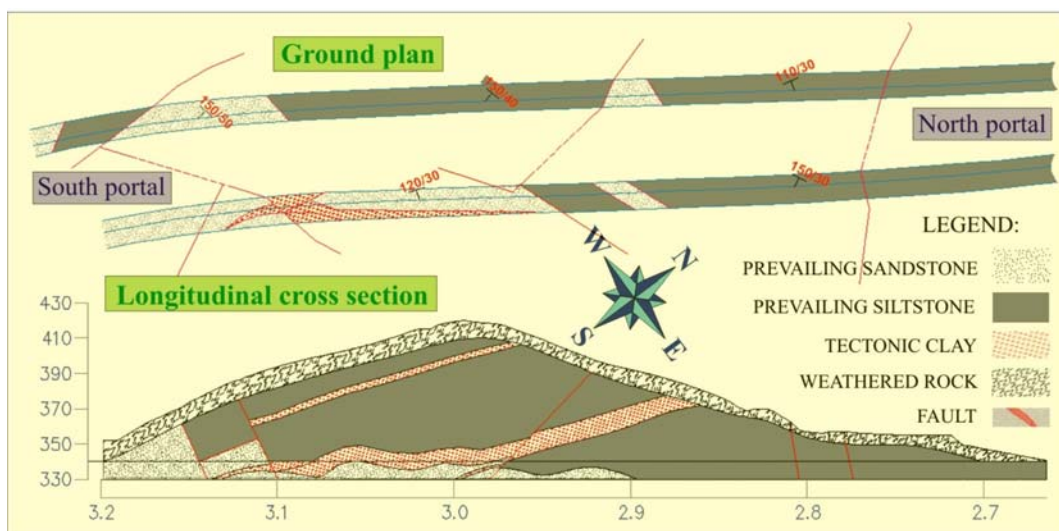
Geological ground plan and longitudinal section of the Golovec tunnel.
